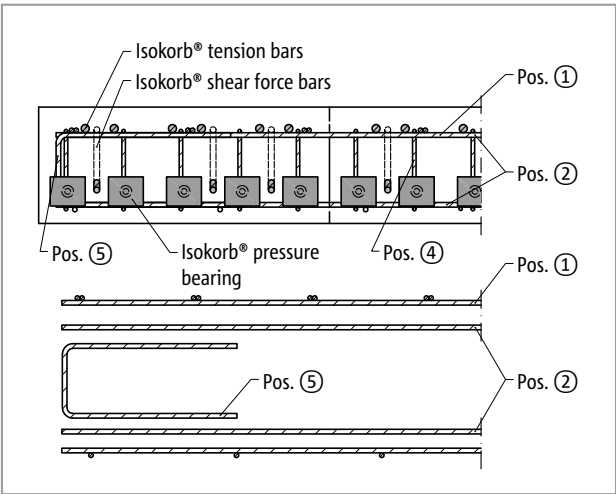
Schöck Isokorb® XT type K-M11: On-site reinforcement balcony side in section A-A; Pos. 5 = side reinforcement on the free edge perpendicular to the Schöck Isokorb
